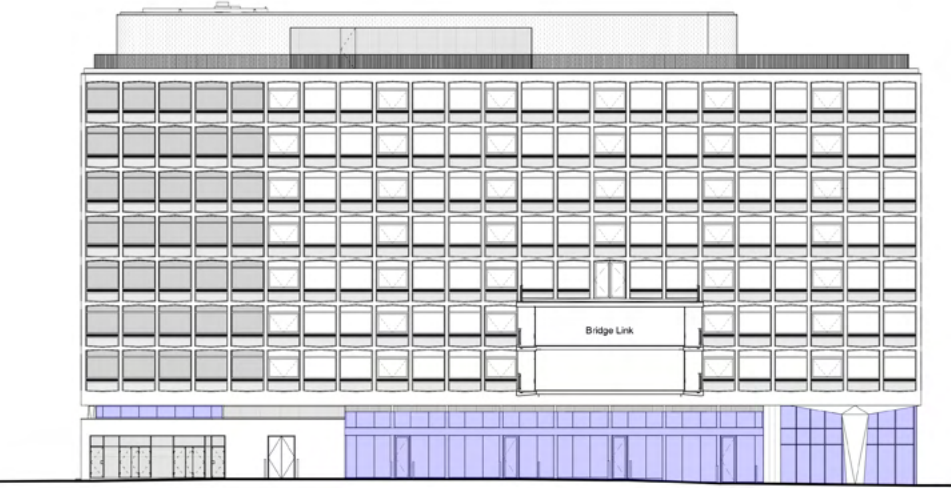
Kingsway East Elevation - MAT 01 location
